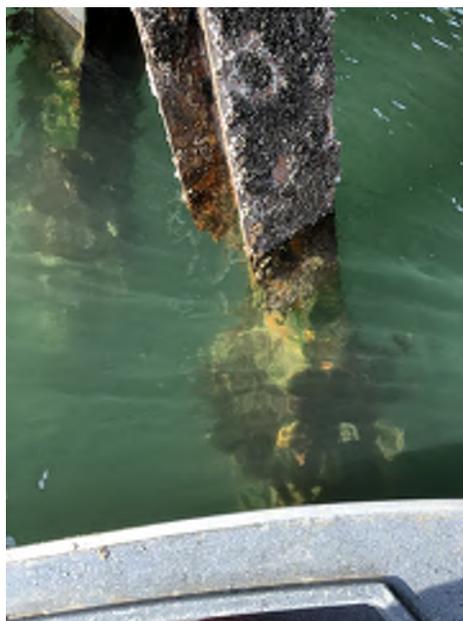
Typical knifing at mean low water. Taken by ASC on 10/22/2020 at 11:09AM.
